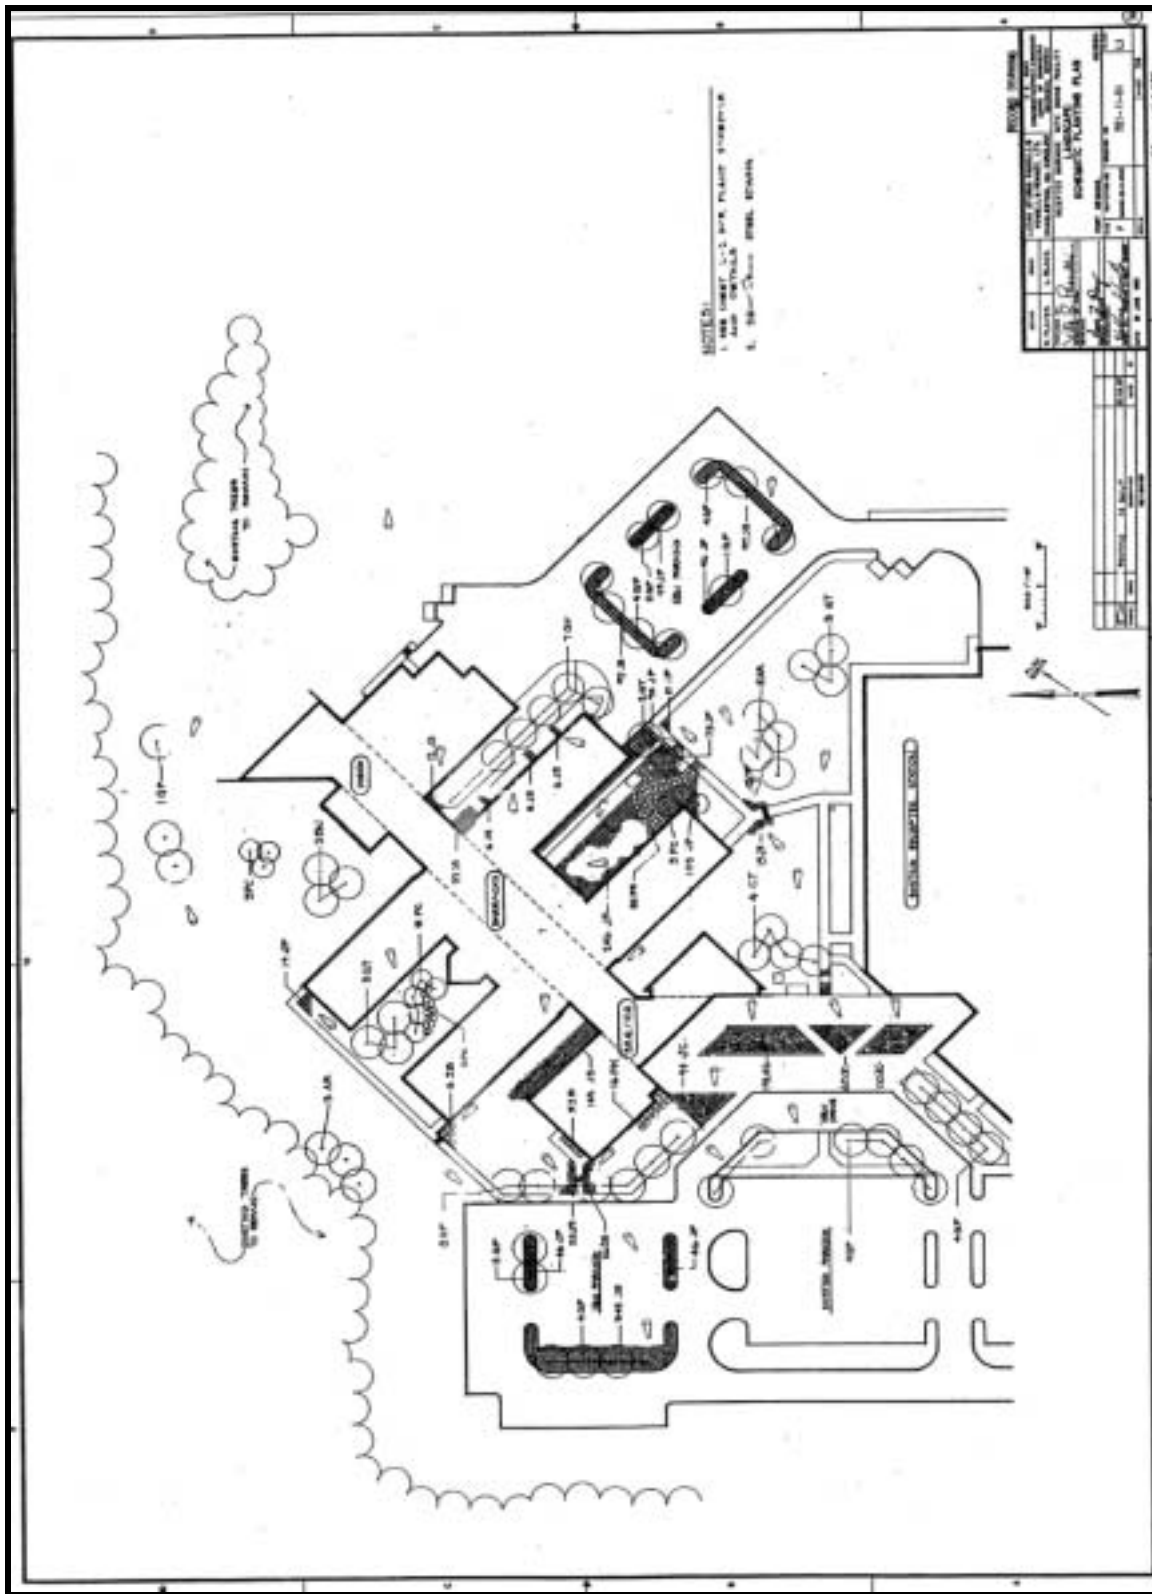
Receptee barracks, landscaping plan (1985, revised 1987) (Engineering, Ft. Benning).
